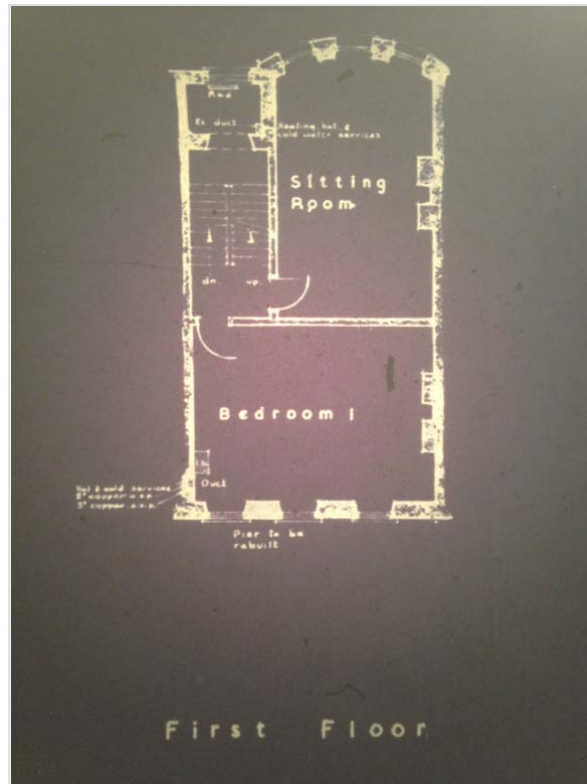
1950 Drainage Plan First Floor²⁶
